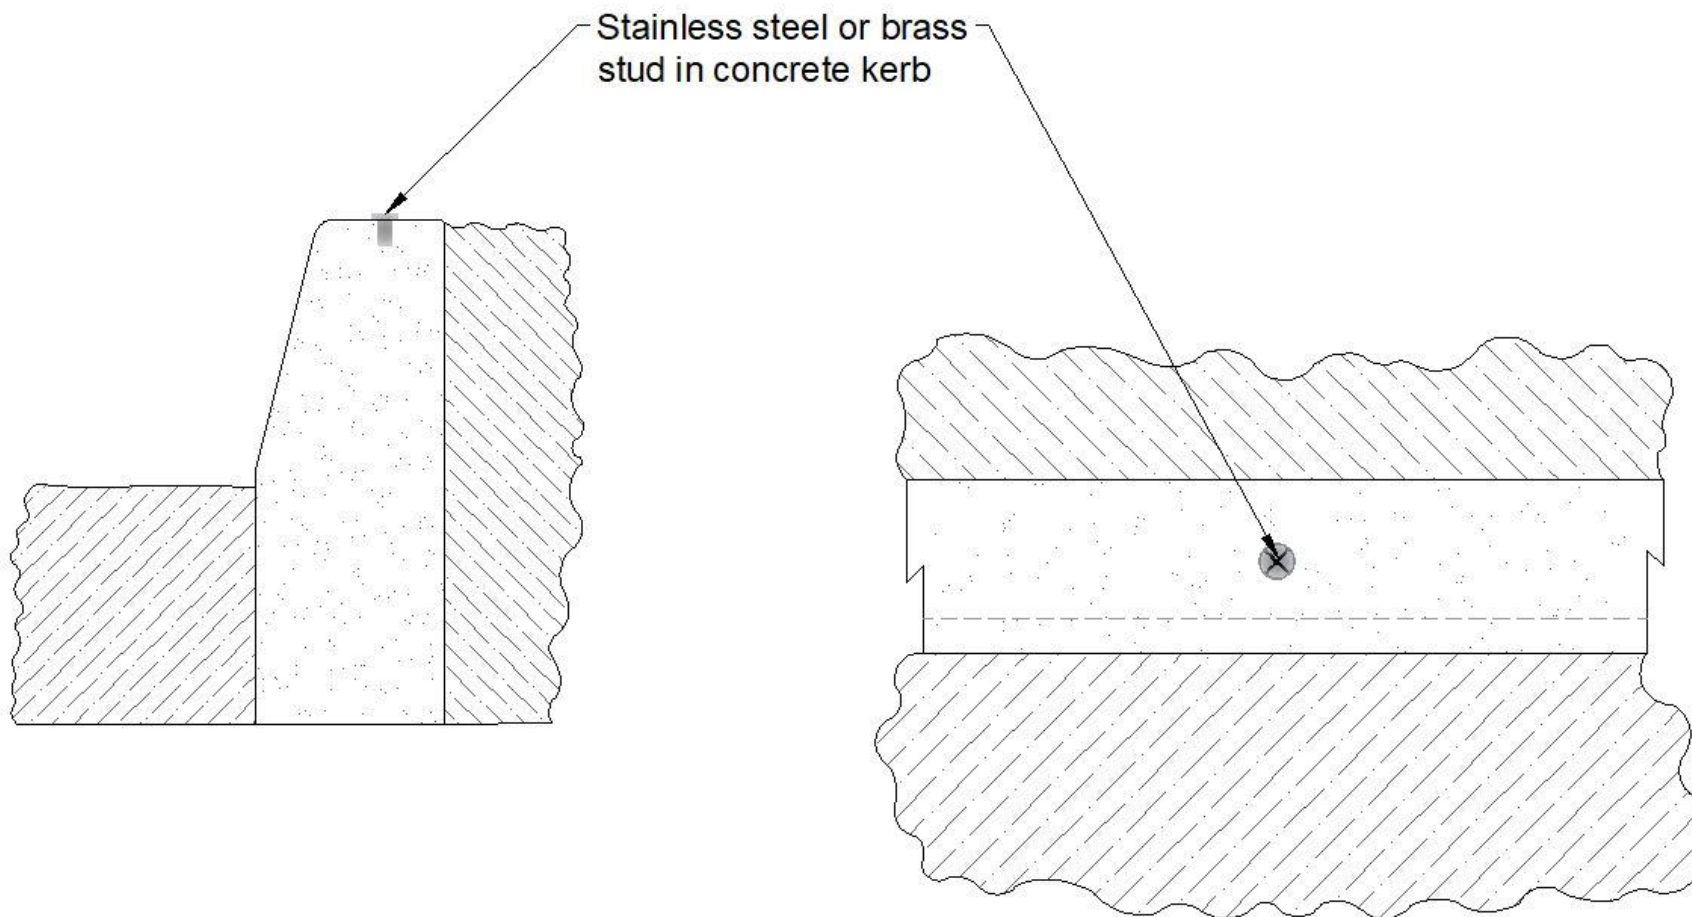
Type 1 marker - suitable for dense, very stable surfaces (e.g. pavements); cross-section (left) / plan (right).
